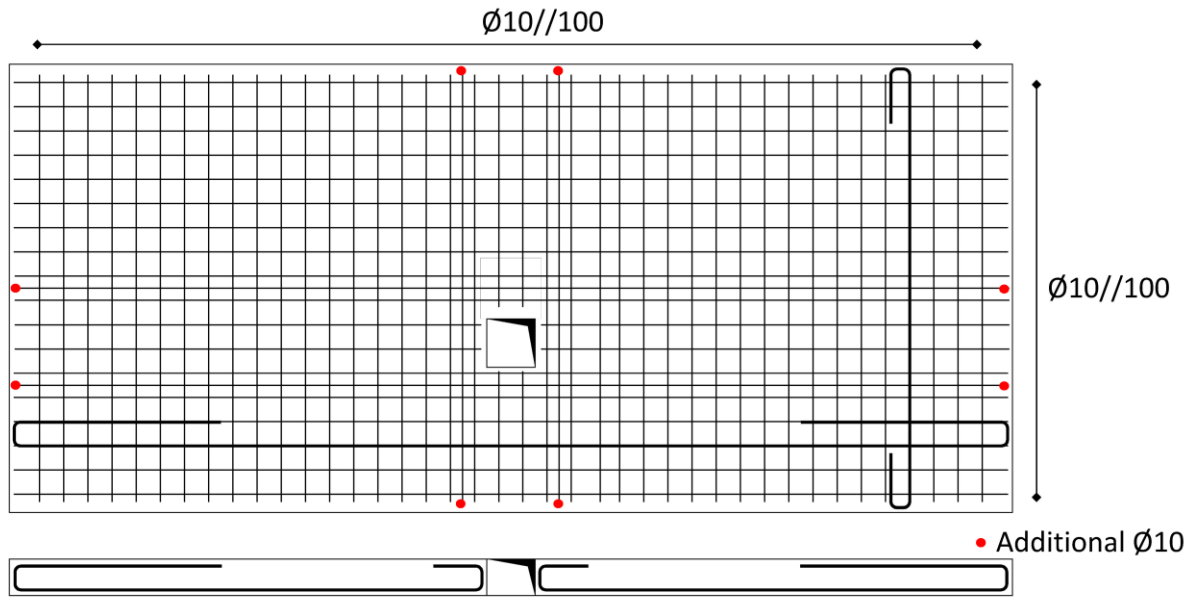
Series SO2: bottom reinforcement detailing.
